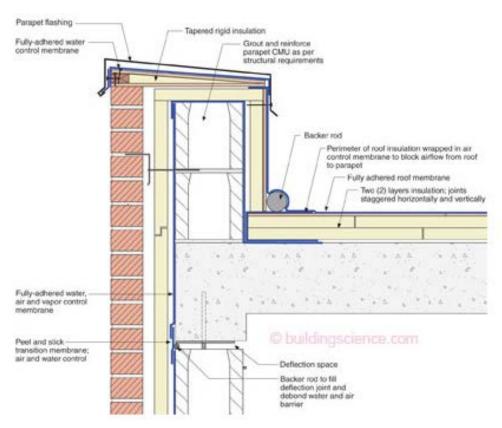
The Masonry Parapet—The thing to note here is that the concrete deck is the air control layer so an additional one is not necessary. However, joints in the concrete deck need to be addressed for air control layer continuity.
